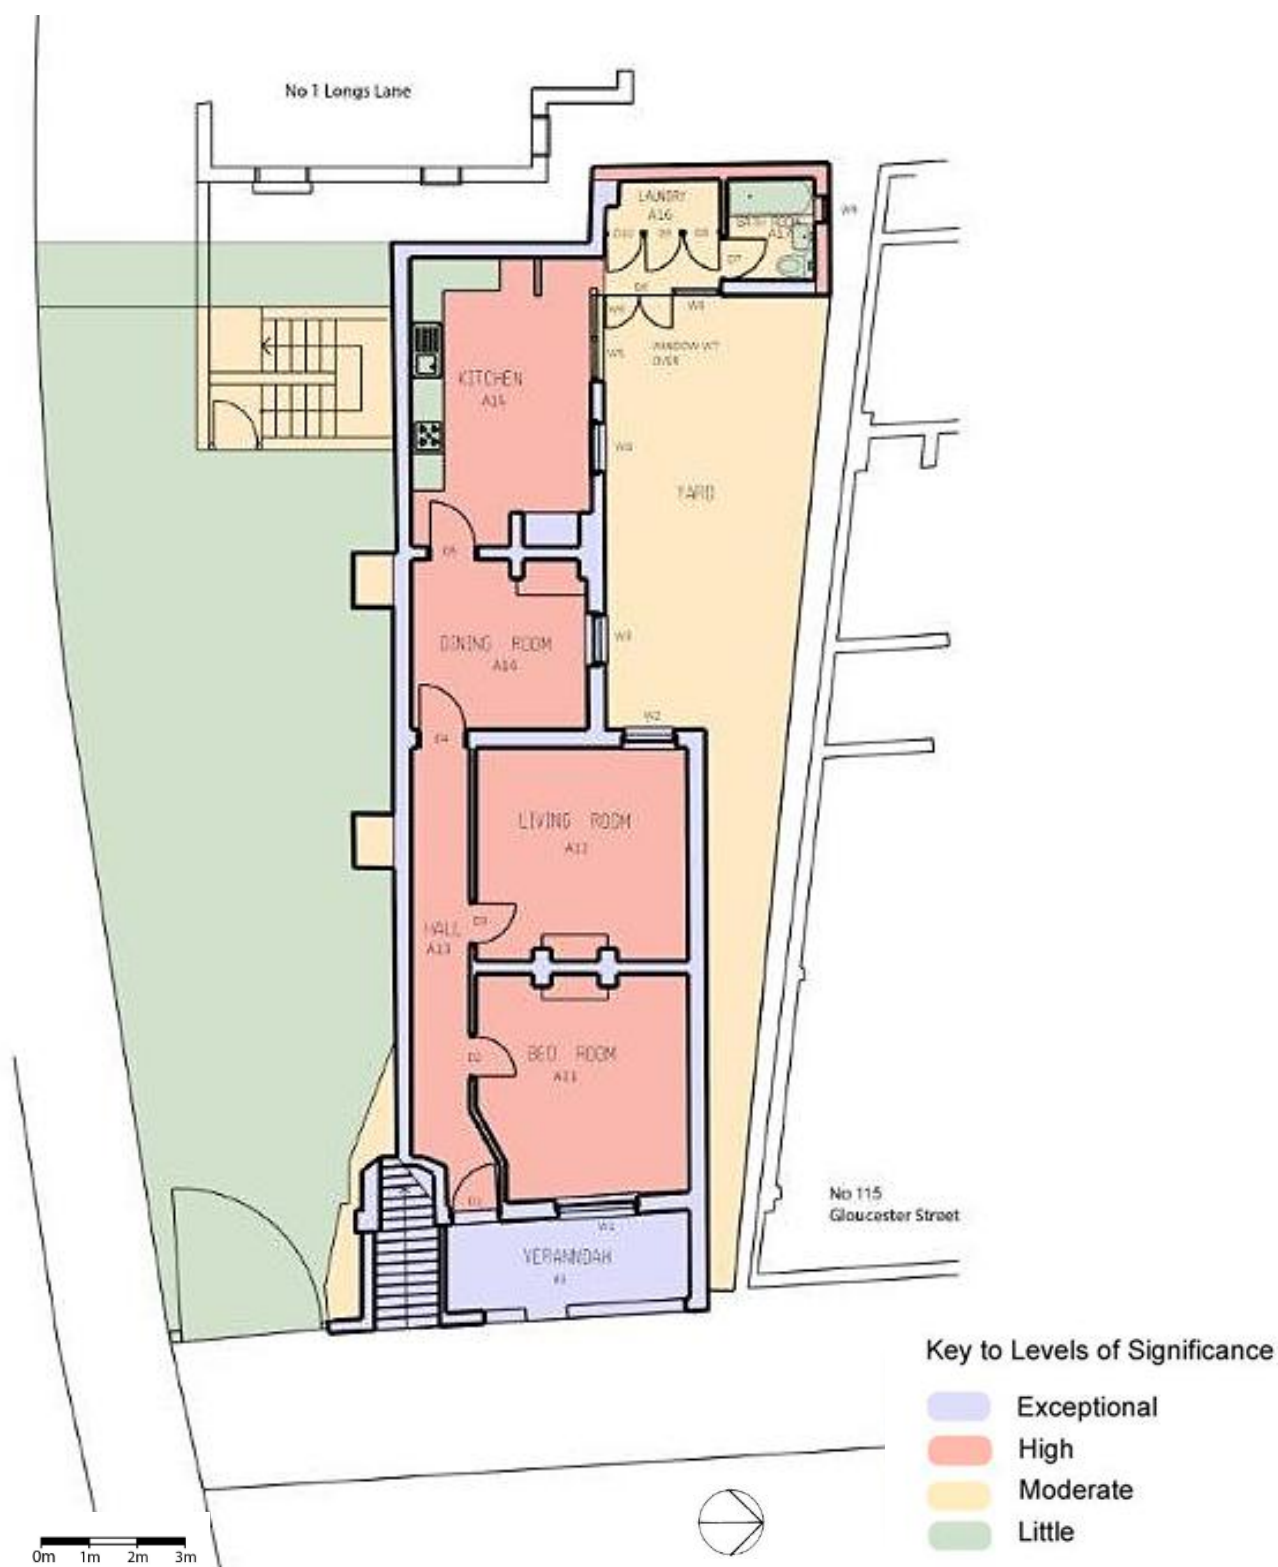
117-117A Gloucester Street – Ground floor grading of significant elements and fabric
